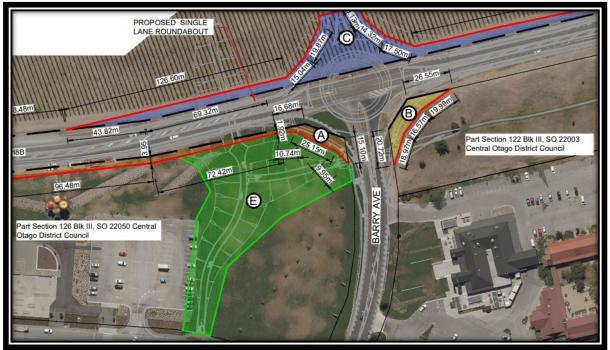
Revised Plan of Works/Land to be Taken from RT OT13B/860
